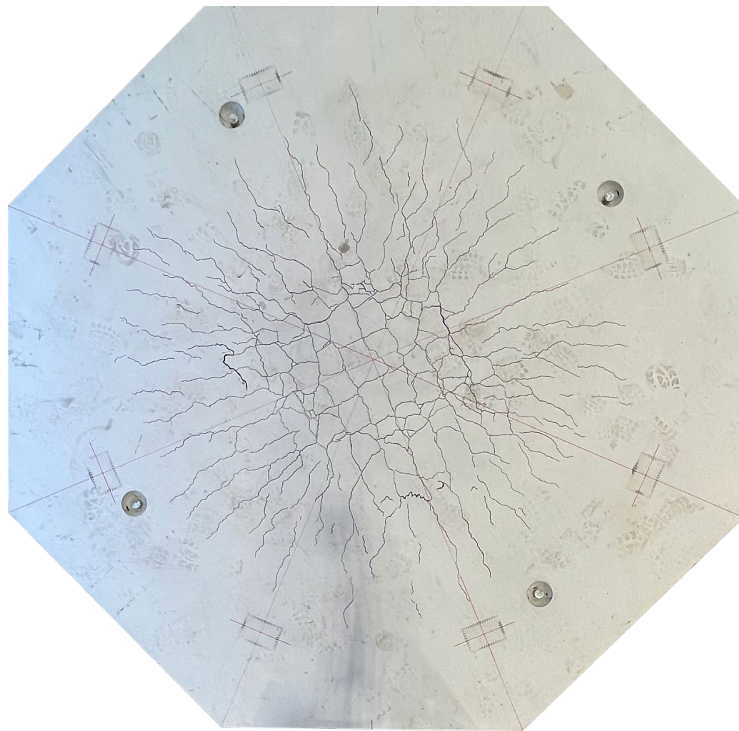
An example of radial and tangential cracks in a typical concrete slab under concentrated loads © Hilti
